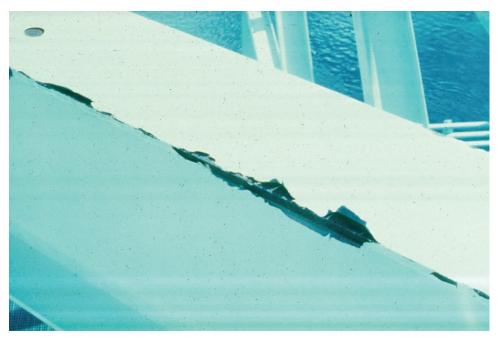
Paint Failure on Edge of Steel Truss Member
